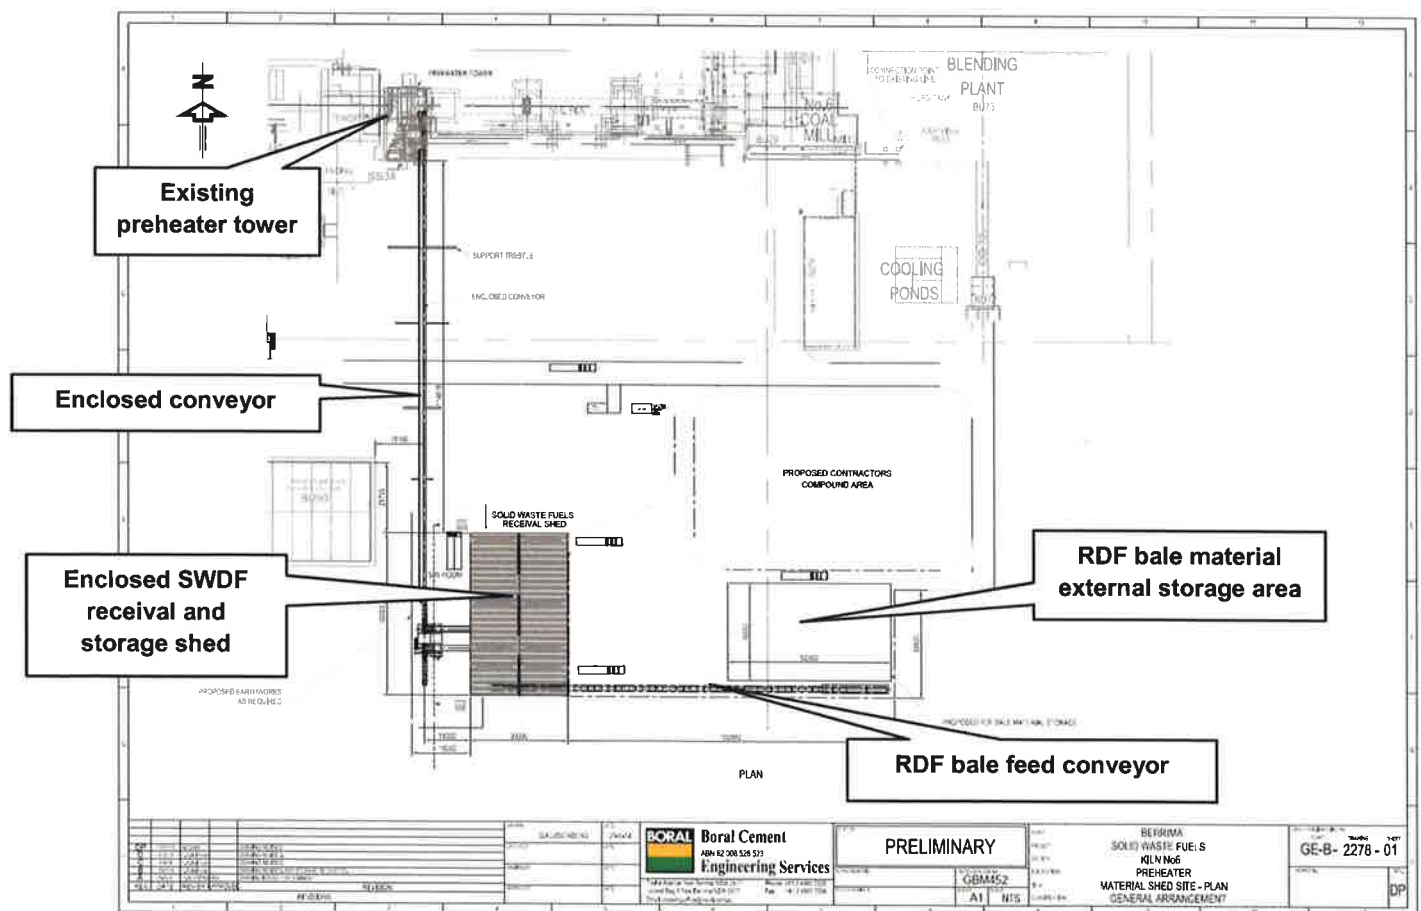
Proposed layout of new kiln feeding infrastructure and storage areas
